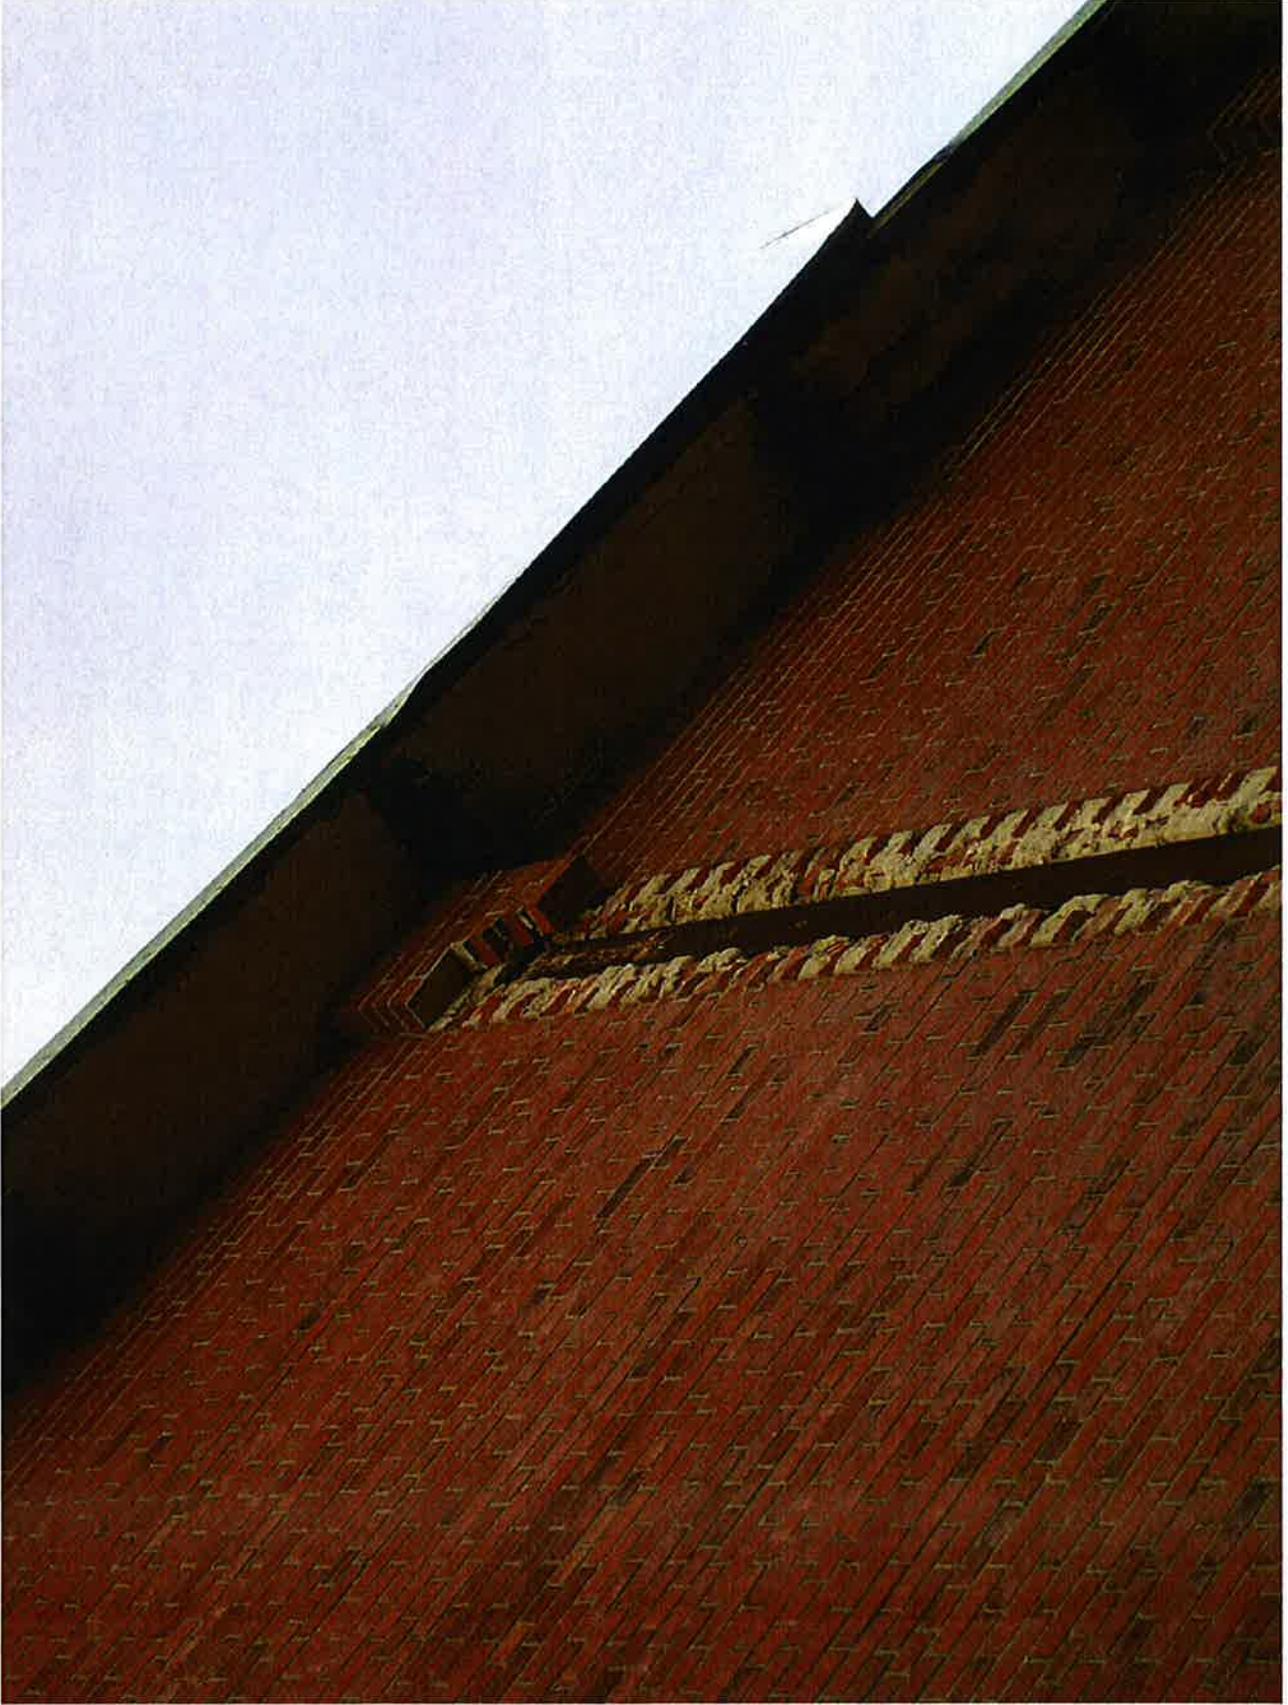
VIEW OF MASONRY DISTRESS AT NORTH WALL OF BUILDING 17
